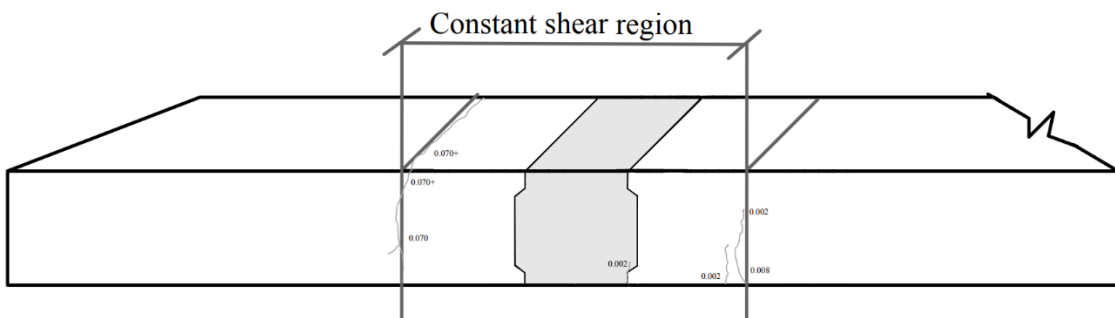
Crack Propagation for Proprietary Short-Term Specimen at 90 % of Final Load
